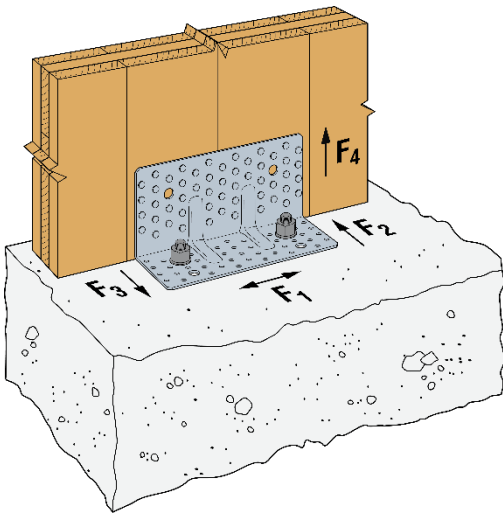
ABR255 – CLT to Concrete (Anchor Option 1)
